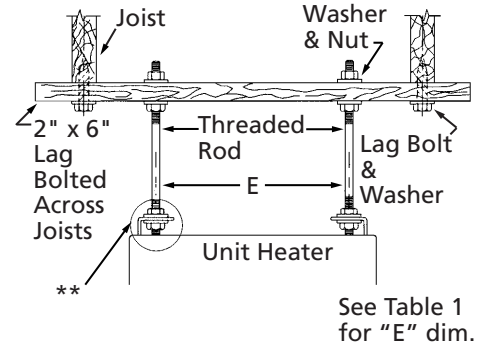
Heater Mounting 100/400 MBTU Sizes – Wood Construction
